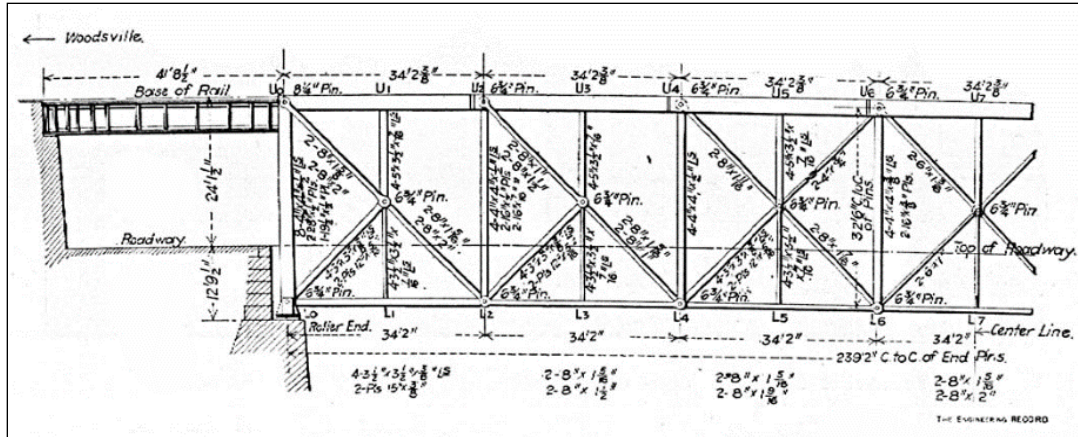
Boston & Maine Railroad Woodsville-Wells River Bridge (Haverhill-Newbury) over Connecticut River. This double-deck three-span steel truss, railroad-over-highway bridge was designed by renown B&M bridge engineer J. P. Snow and built in 1904. John Storrs, assistant engineer, was in charge of construction and inspection. Although touted as “equal to almost any loads that could possibly be brought upon it,” an ice jam toppled the piers out from under it in 1922. The towns sued the builder, United Construction Company and finally prevailed in 1927, proving that instead of resting on bedrock as required, the piers were set 30 feet above it. Storrs' role as construction inspector would have been central to the case but his trial testimony, if any exists, was not gathered for this study (*Engineering Record*, 1904).
